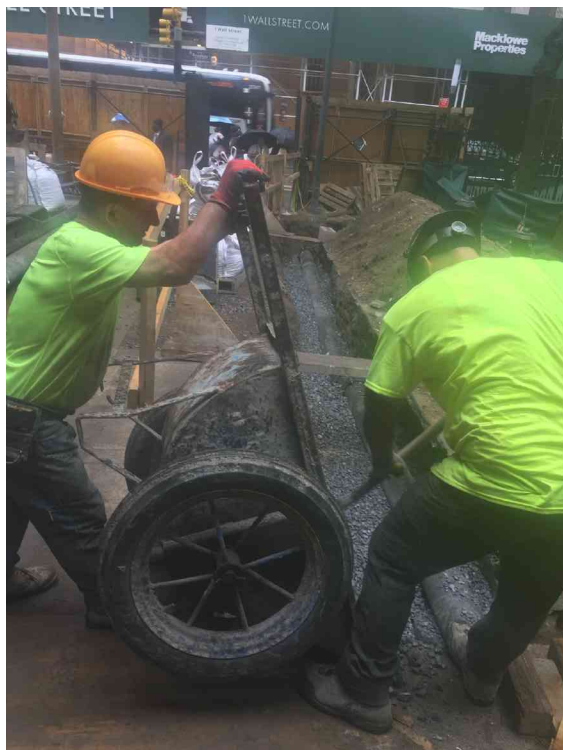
Excavation of the south drainage trench was underway on 8/28/19. The view is west on the South Terrace. (J. Geismar 8/28/19)
